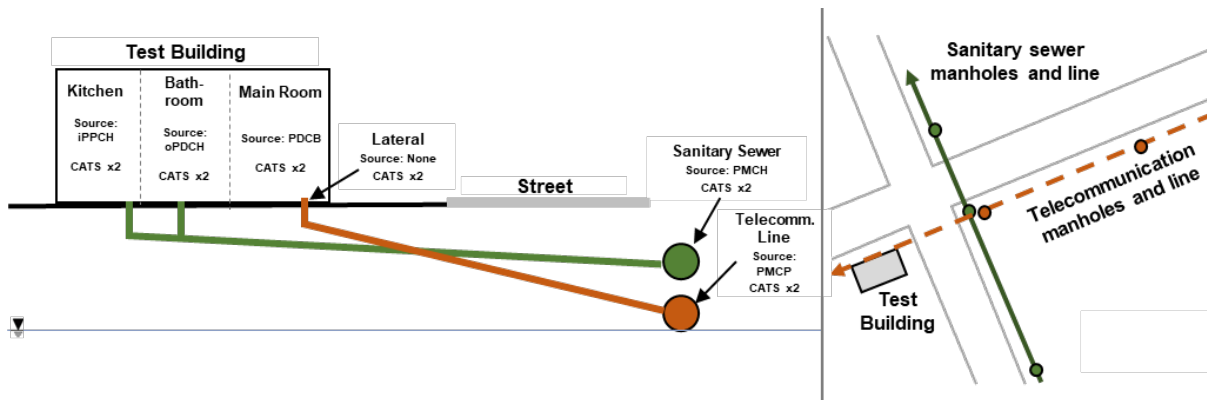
Example Tracer Configuration: Testing Two Underground Utility Lines
